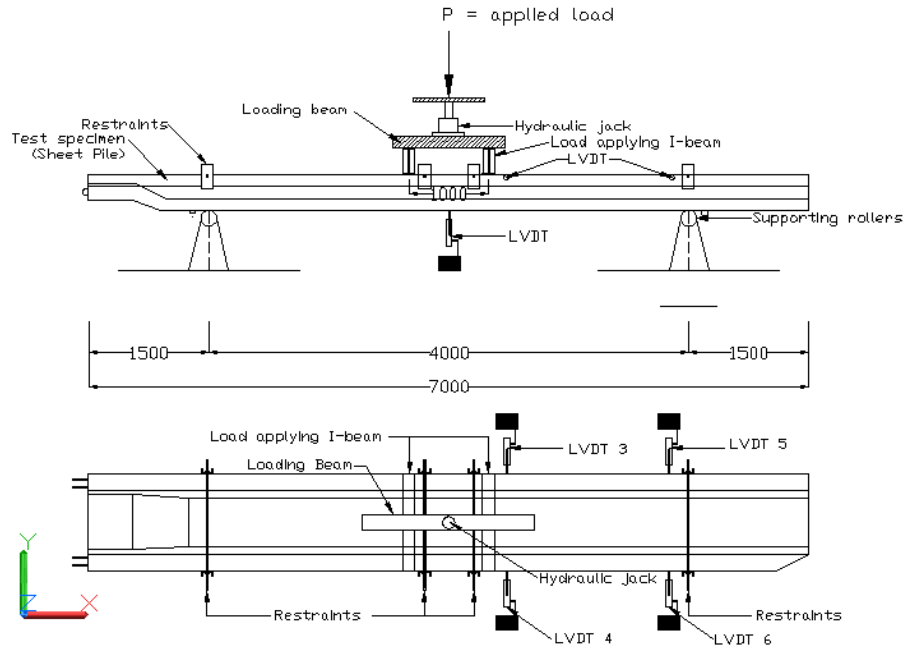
Schematic diagram of testing set up for precast concrete sheet pile.
